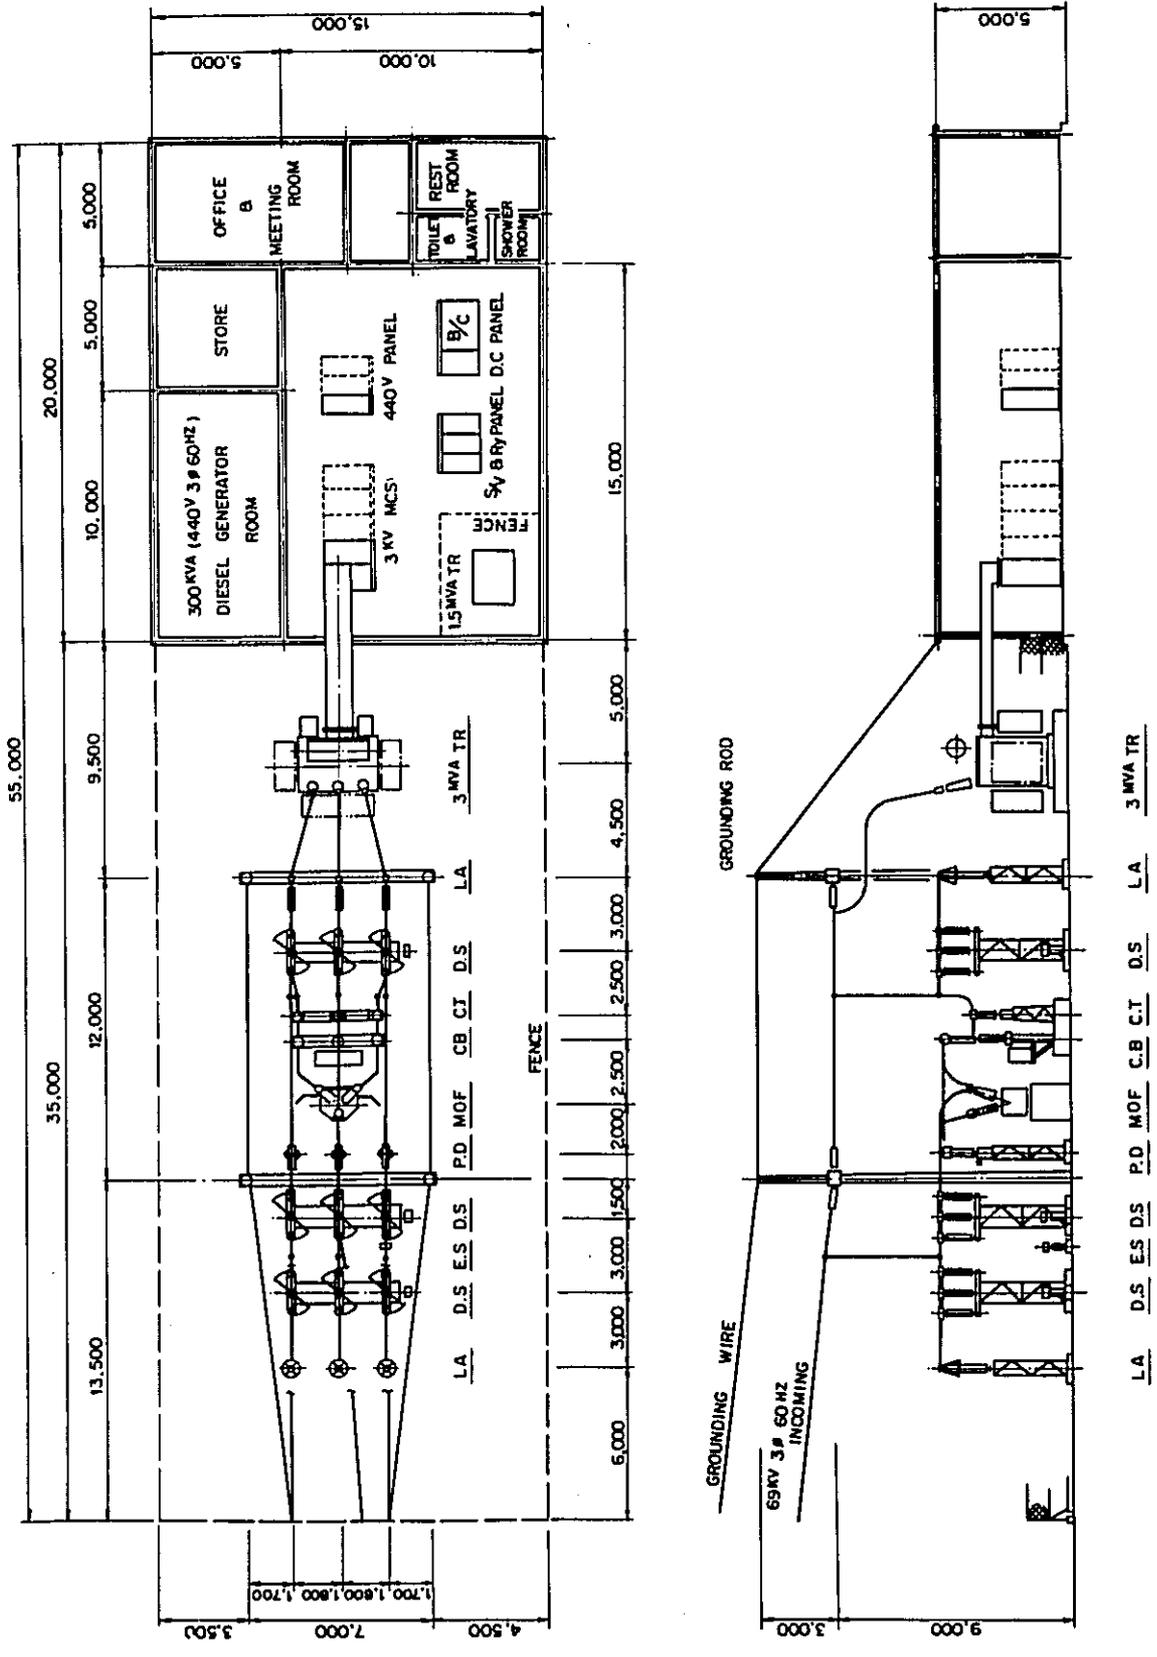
Layout of Substation, 69KV, 3 MVA
